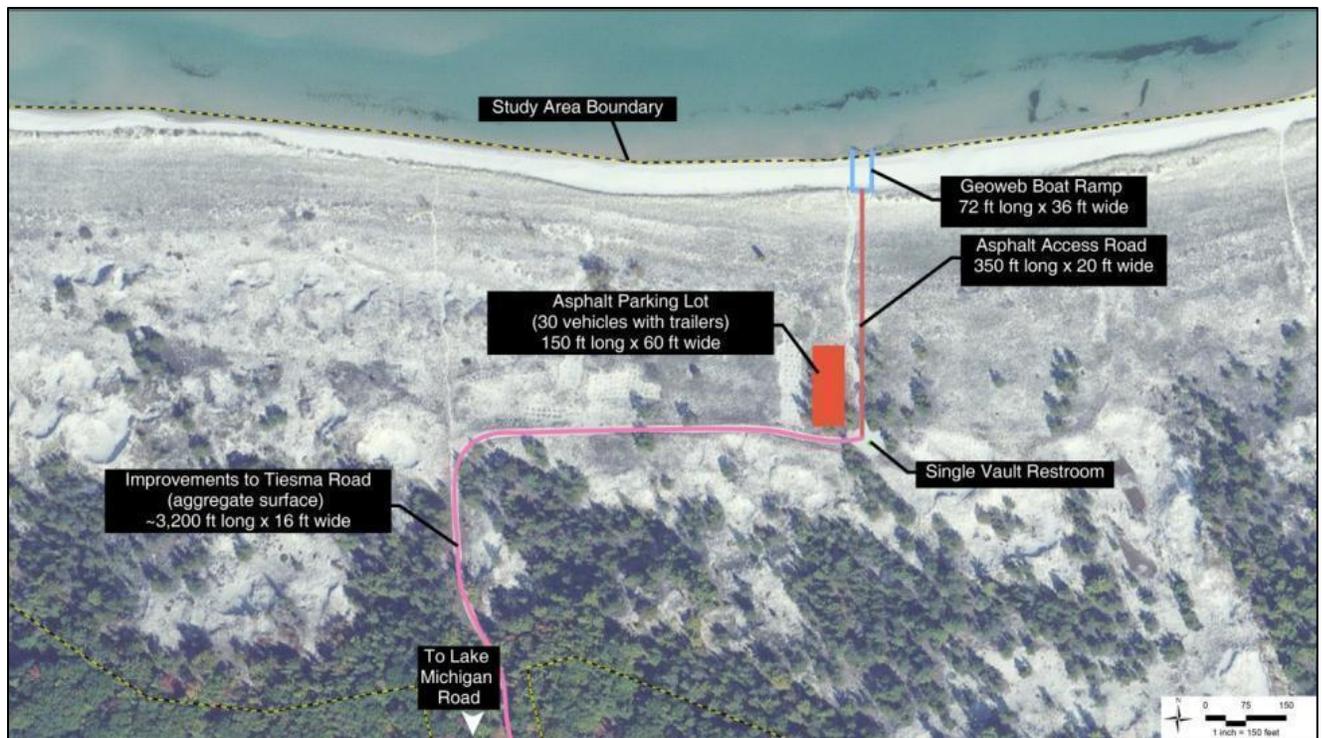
Proposed layout of improvements at Tiesma Road.
